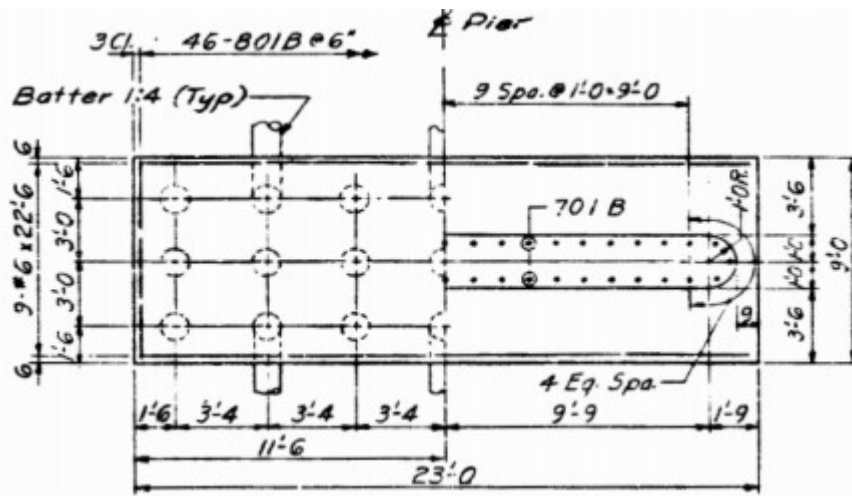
System A: Cross Section of Typical Interior Pier of the Bridge (NBI 33420) (1986)
